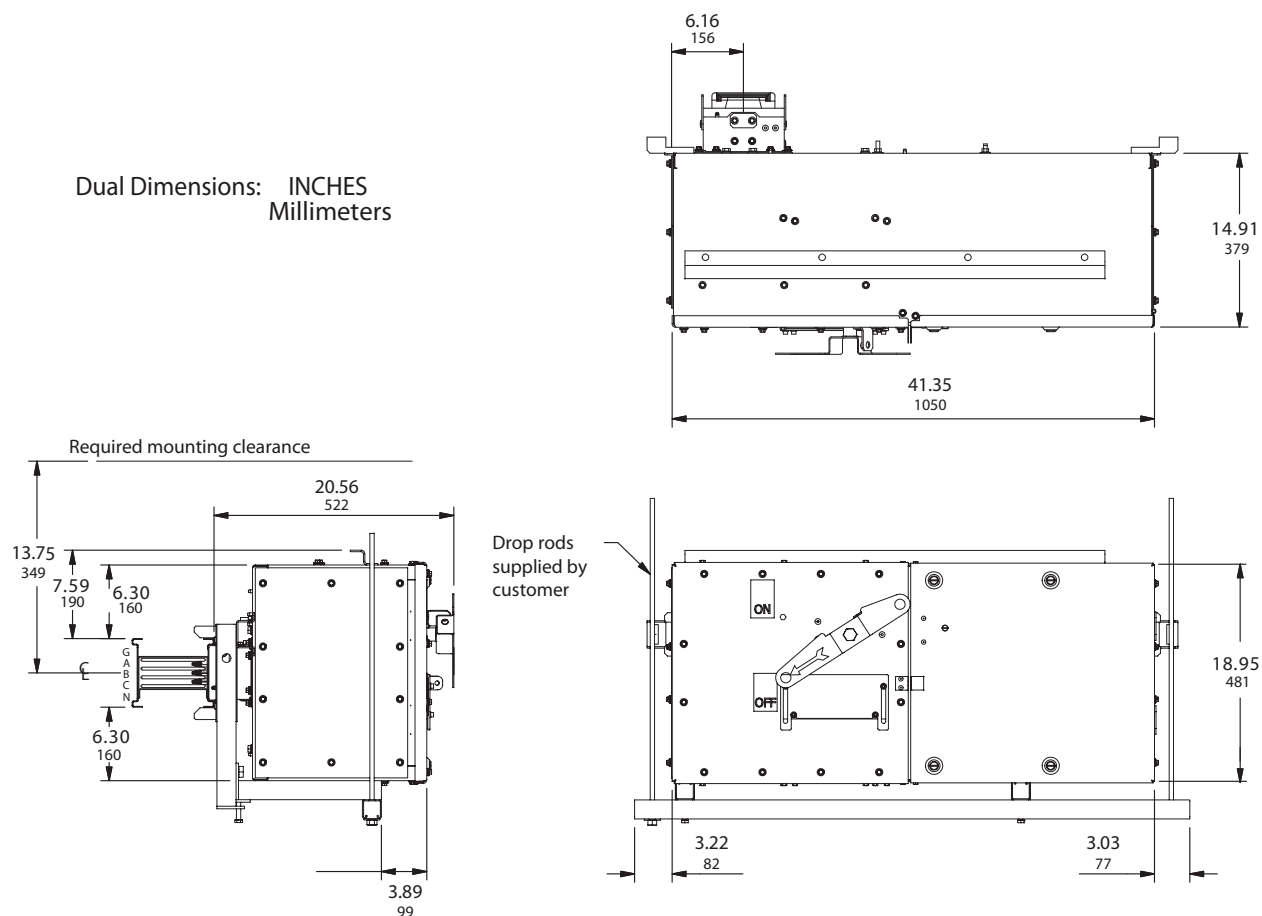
Circuit Breaker Bolt-On Units (Horizontally Mounted)—250–1200 A
